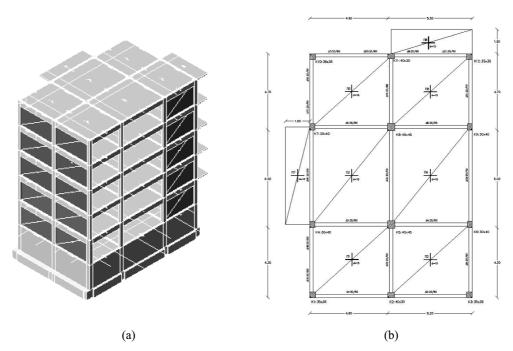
(a) 3D view of the seven-story building and (b) typical floor plan
